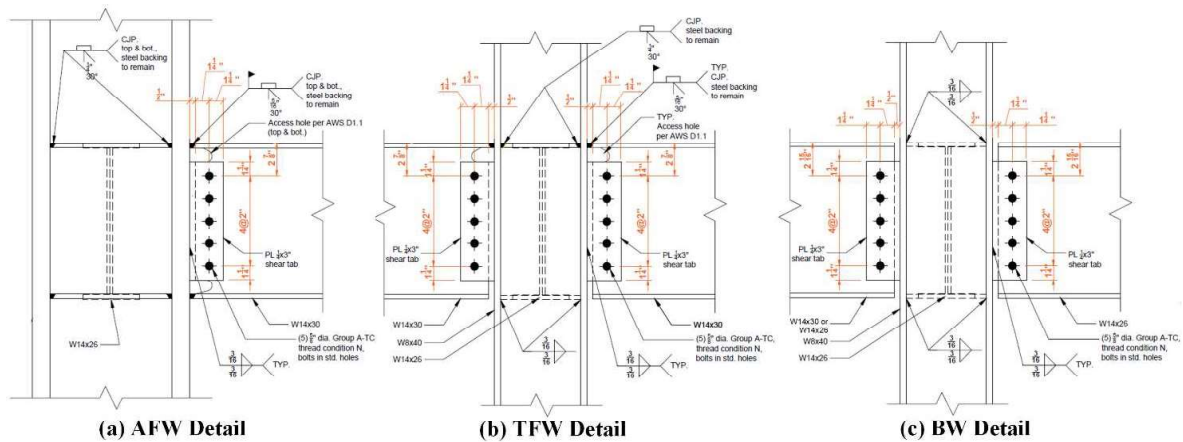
Collector-to-column connection details: (a) AFW; (b) TFW; and (c) BW details
